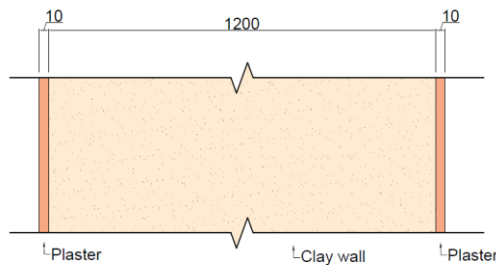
M4 external wall cross-sectional detail. All dimensions are in millimetres.
